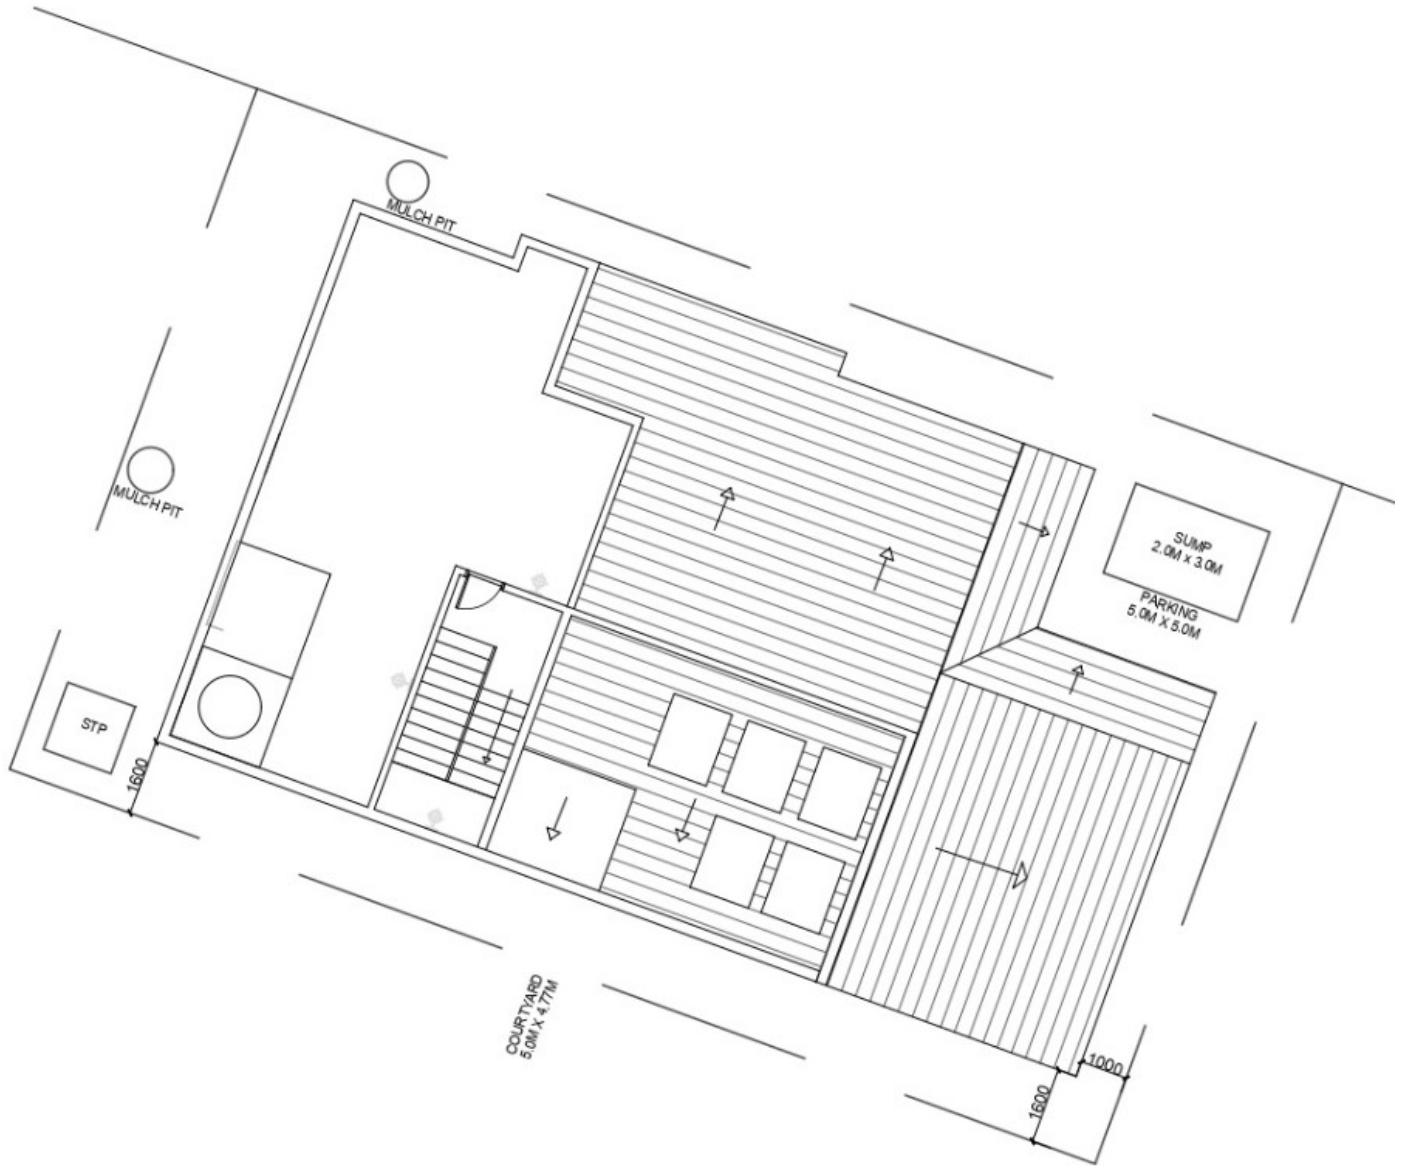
TERRACE LEVEL PLUMBING PLANS
